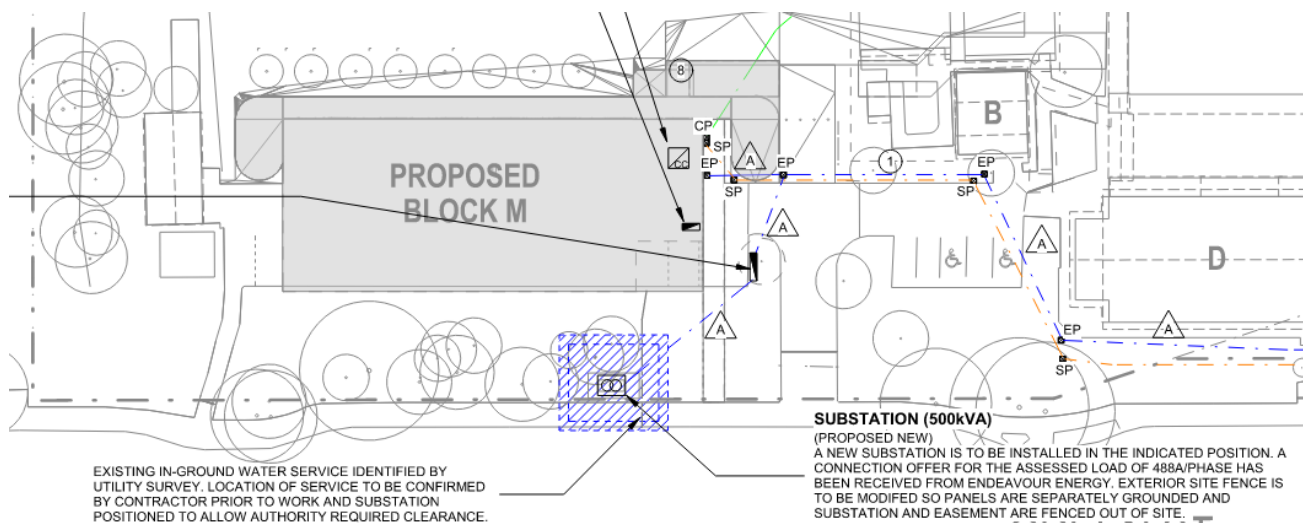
PROPOSED LOCATION FOR SUBSTATION
